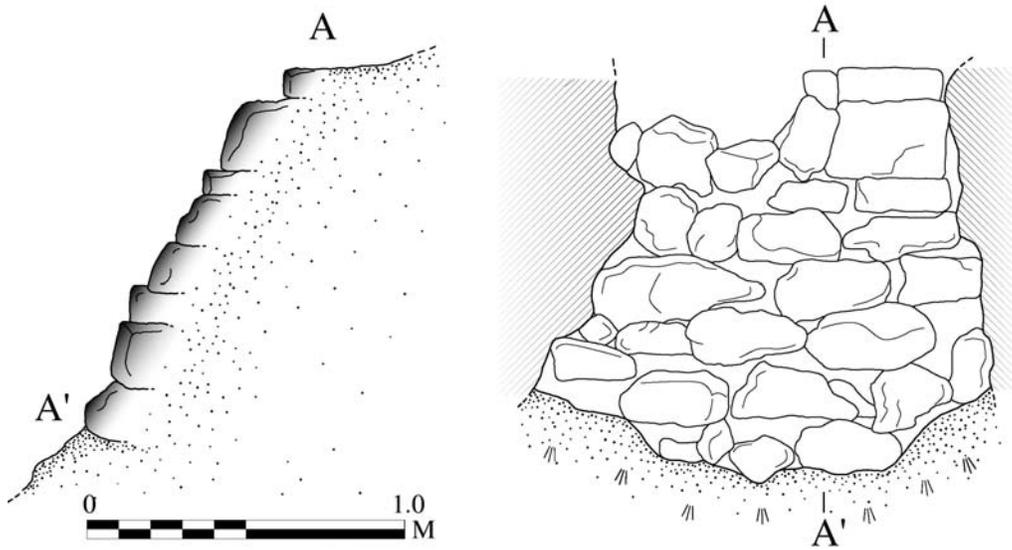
Section and elevation of Wall 3, Passage 4, Southern Entrance Area.
